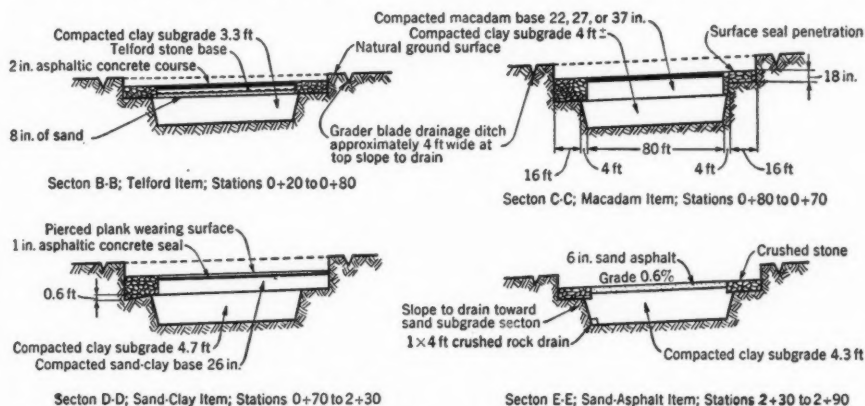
TYPICAL CROSS SECTIONS, TEST SECTION, MARIETTA, GA. (PLAN AND PROFILE IN FIG. 22)
